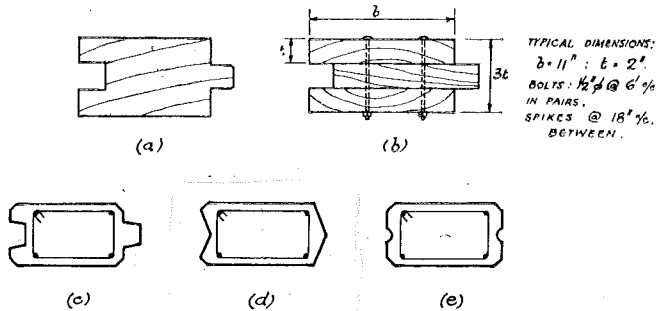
TYPICAL SECTIONS OF TIMBER AND CONCRETE SHEET PILES.
